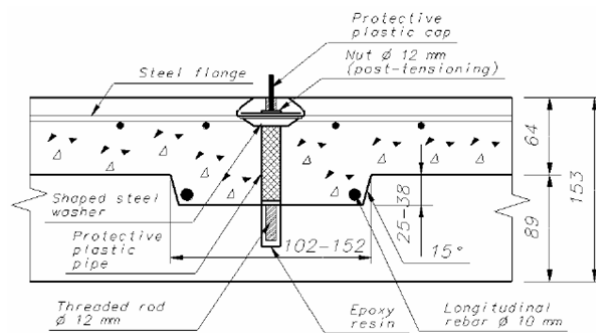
shear key/anchor connection detail (dimensions in mm) (after Gutkowski 1999)
